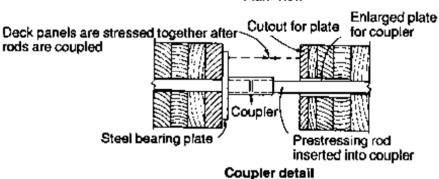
Method of joining two prefabricated, prestressed longitudinal stress-laminated bridge panels.
